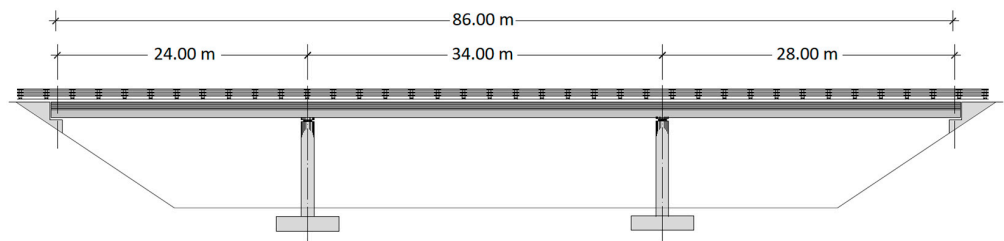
Longitudinal profile of the PC slab road bridge [21,22].
